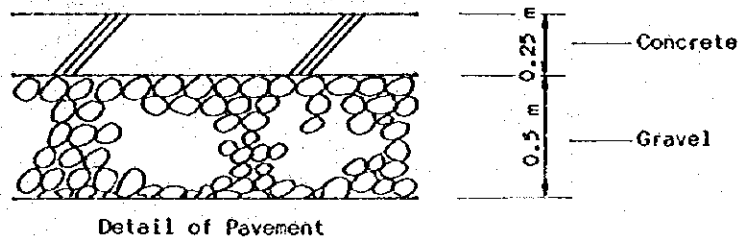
Proposed Structural Improvement for Pier 16
